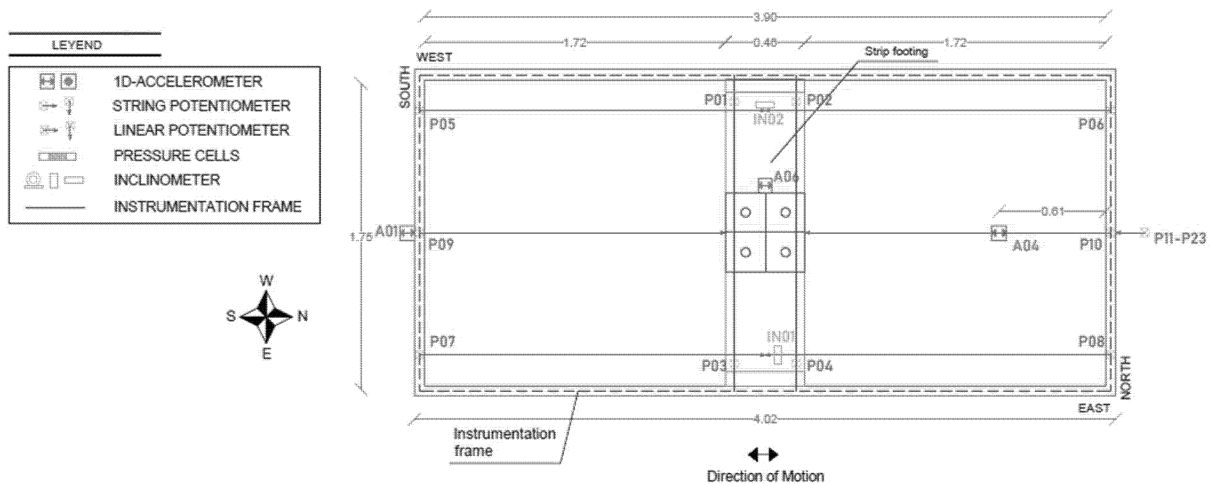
Typical sensor and measurement device locations shown in plan view within a testing specimen (Note: See appendices for actual instrumentation layouts).
